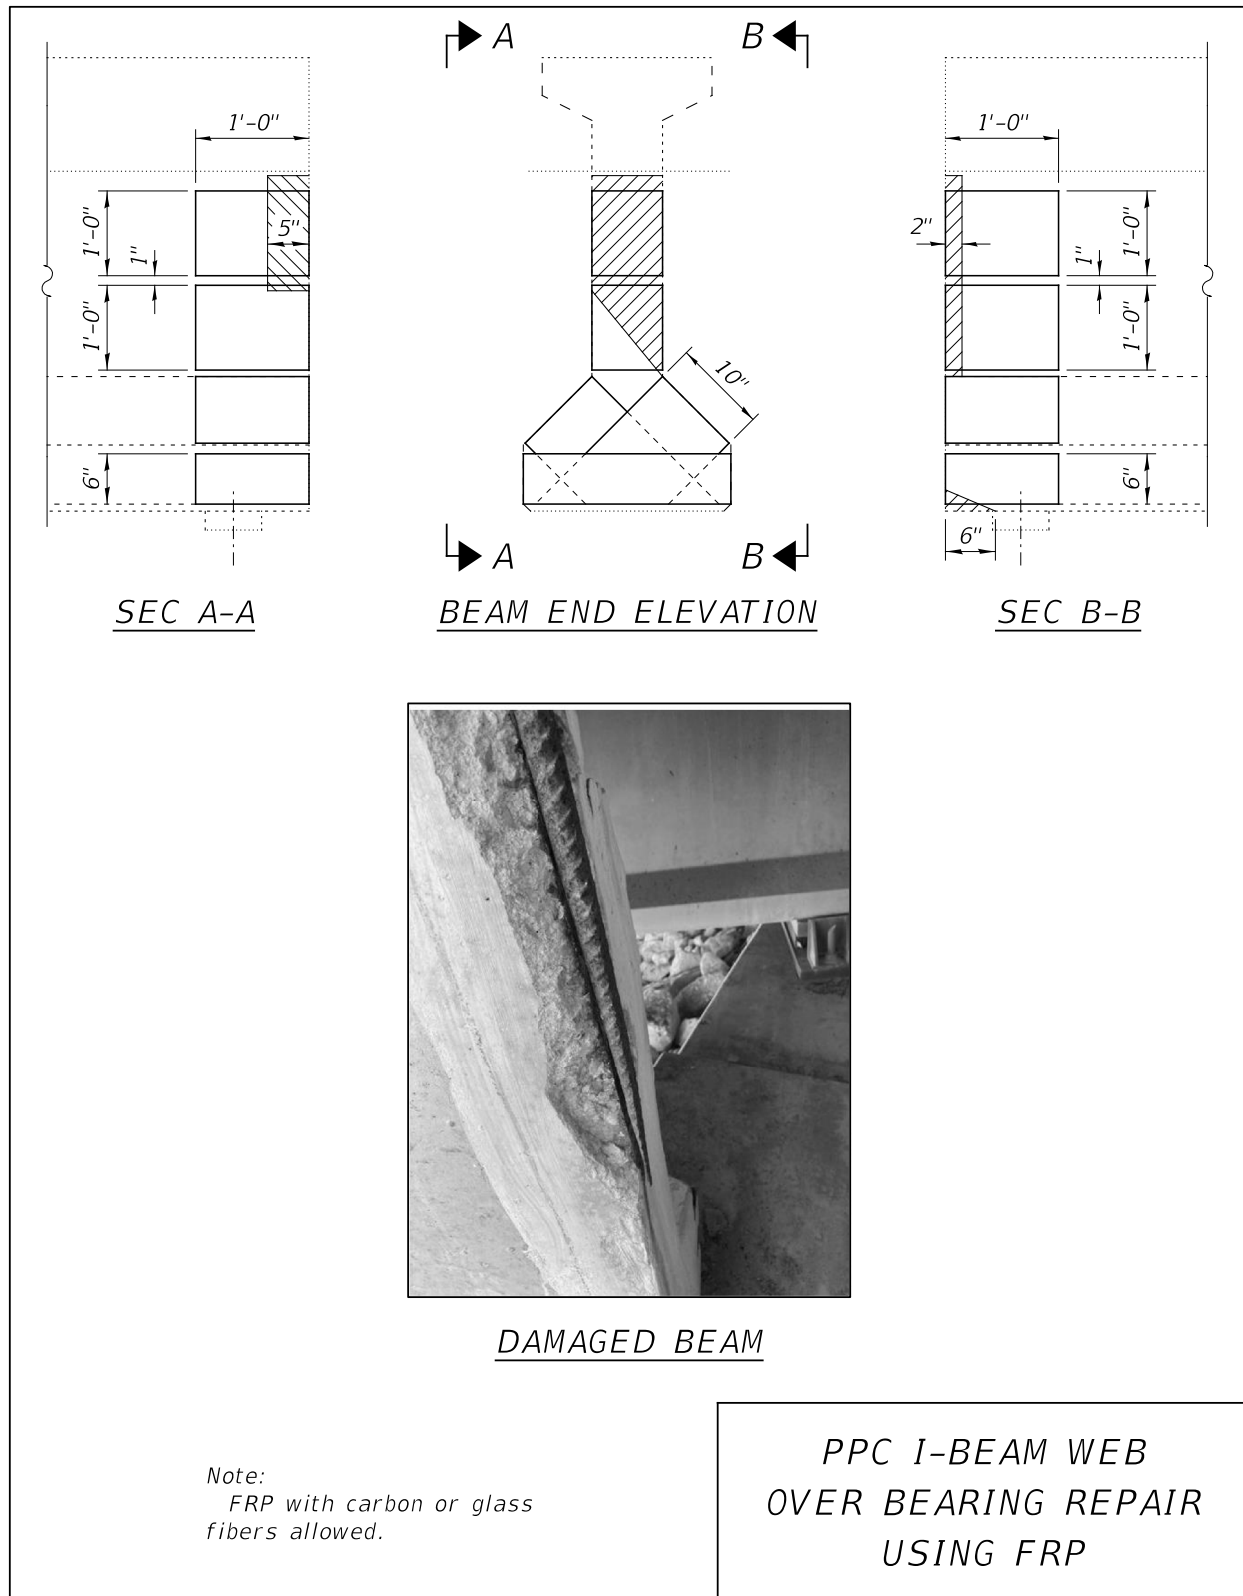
PPC I-Beam Web Over Bearing Repair Using FRP
